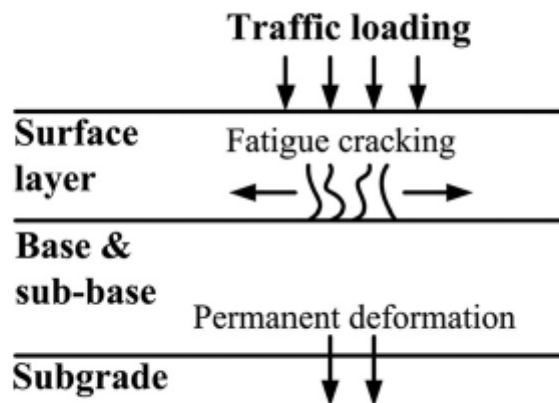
Fatigue cracking and permanent deformation illustrated for a typical asphalt pavement structure (Han and Vanapalli, 2016)
